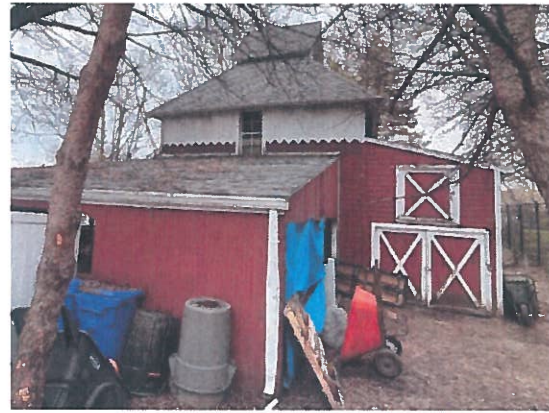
North Elevation. Note the smashed downspout at the lean-to.
